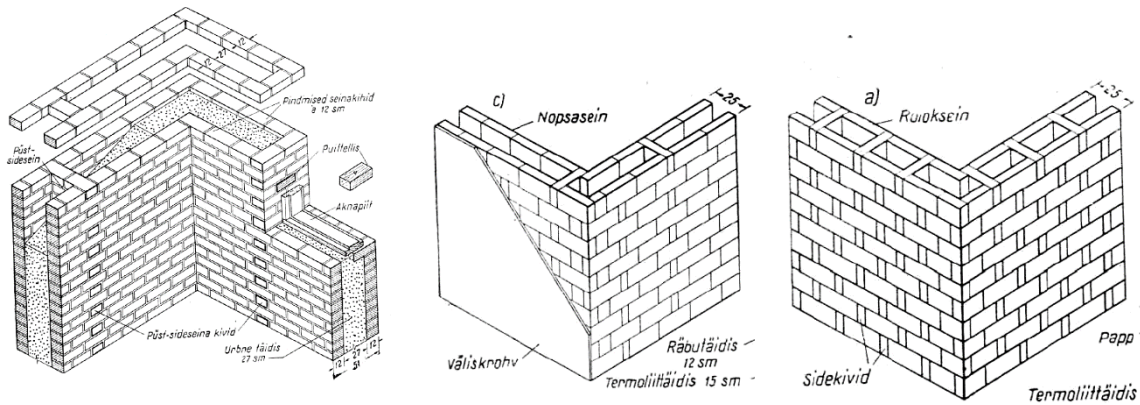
Examples of insulated brick structures incorporating exclusively brick and insulation (left to right: Gerard wall, Nopsa wall, Rolok wall) (Veski, 1969)
